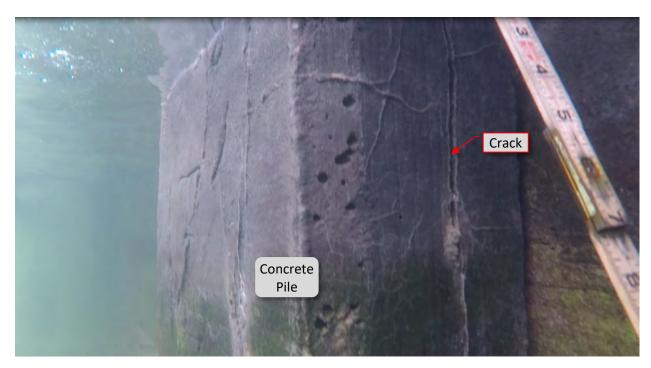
P18. STA 3+71. Crack at east flange at pile. Underwater view.
